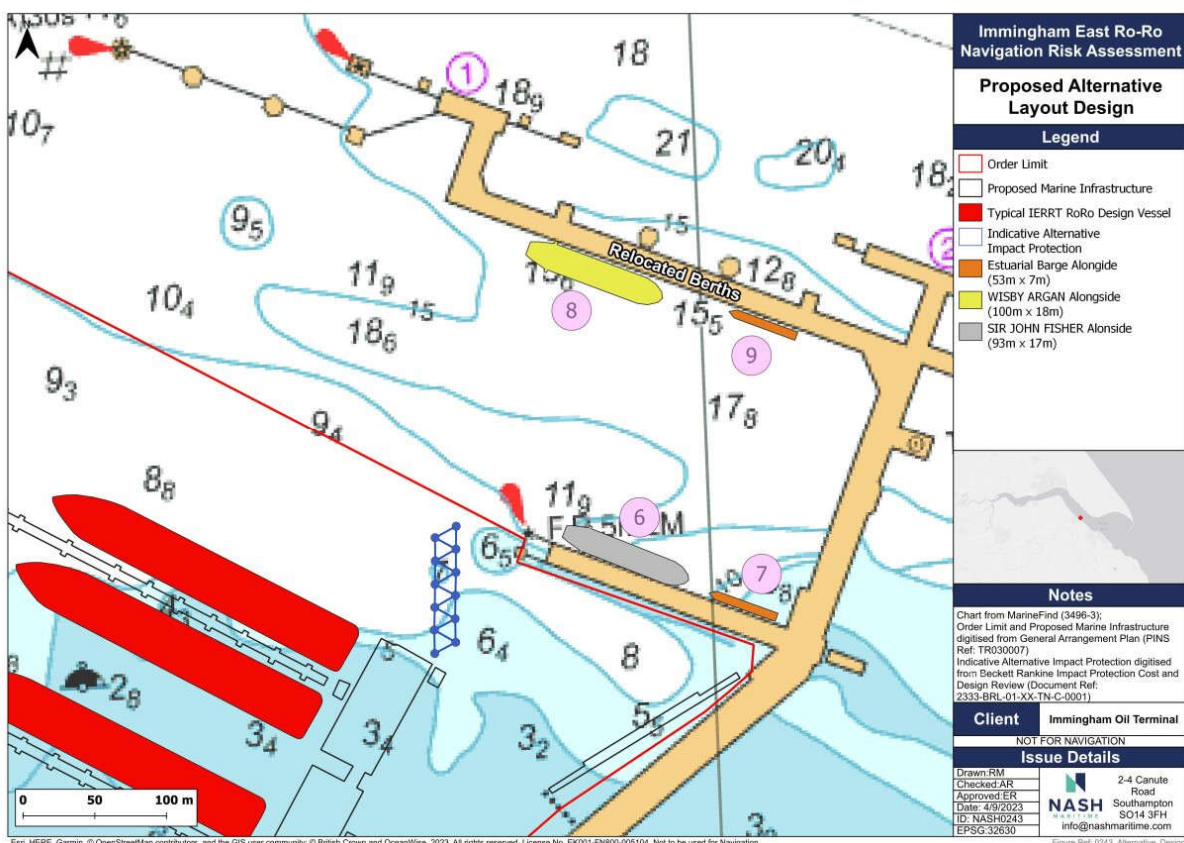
IOT Proposed Layout for Impact Protection and Relocation of Finger Pier.
